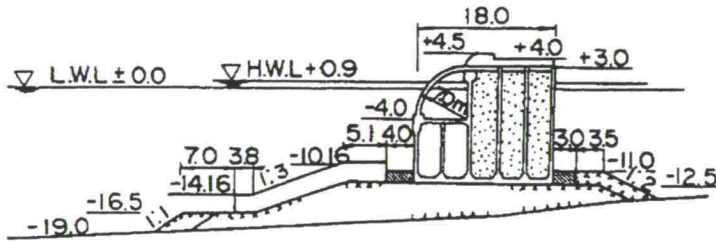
, Cross section of curved-slit caisson breakwater at Funakawa Port
